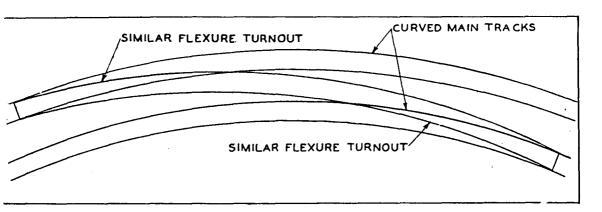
CROSSOVER USING SIMILAR FLEXURE TURNOUTS
